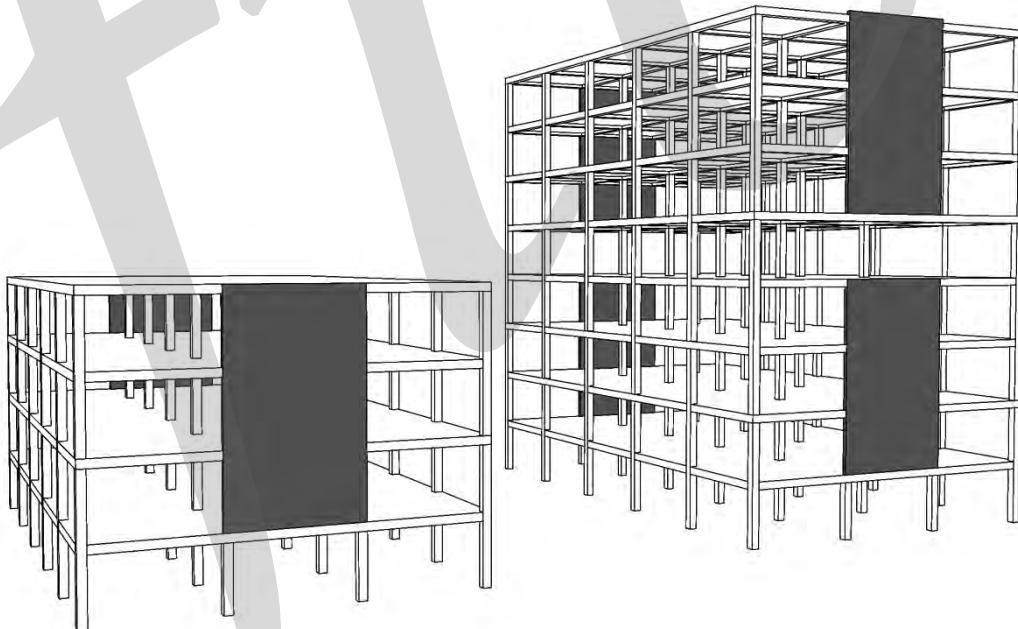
Soft-storey ground floors and soft-storey upper floors, which should be avoided [37]
